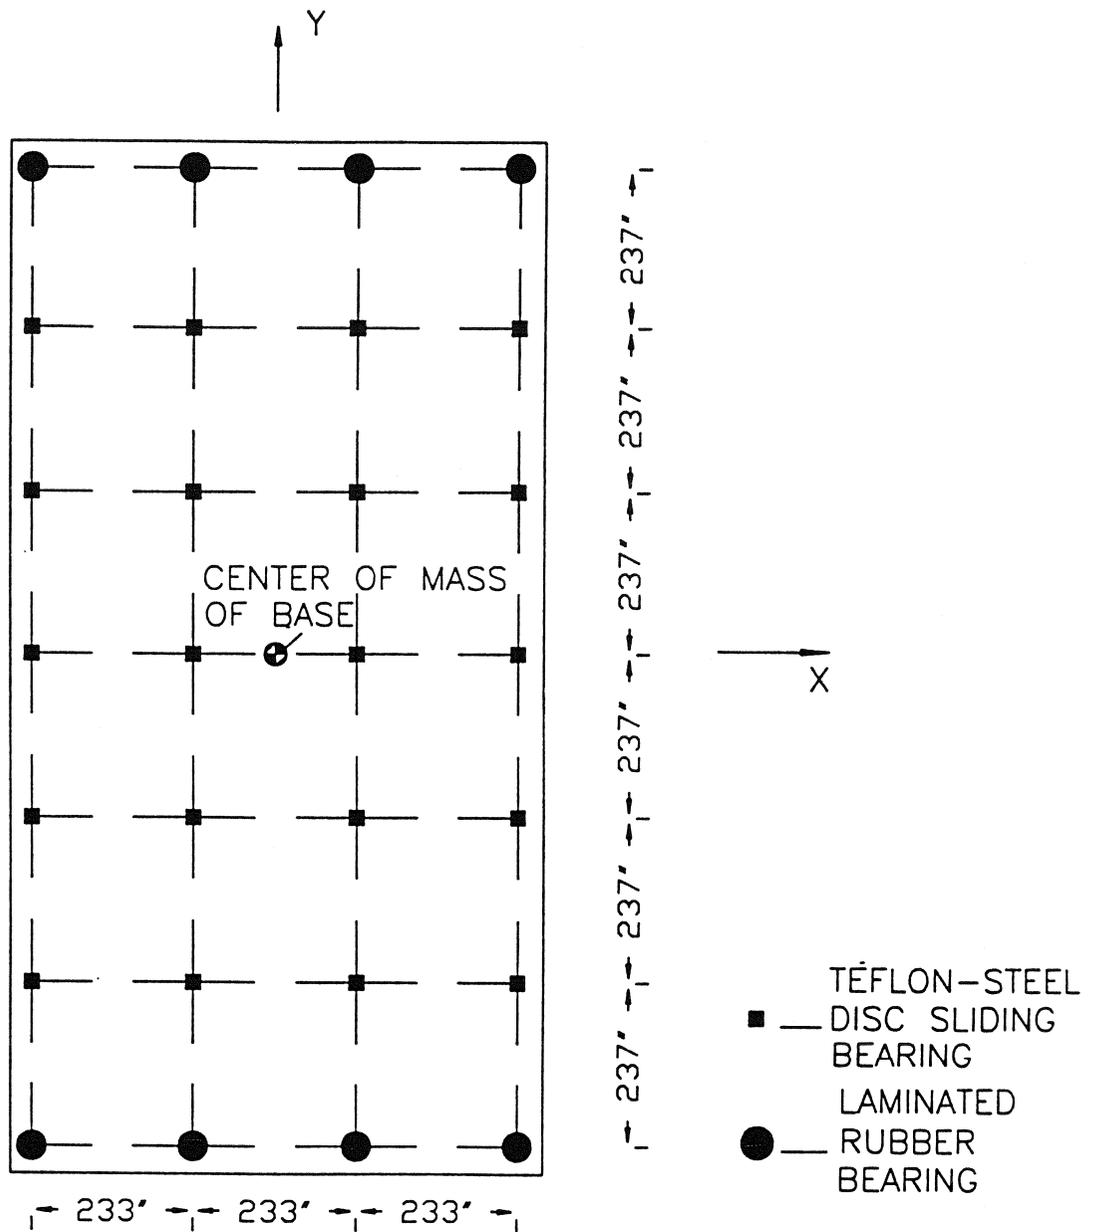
Plan of the Isolation System with Laminated Rubber Bearings and Teflon - Steel Disc Sliding Bearings
